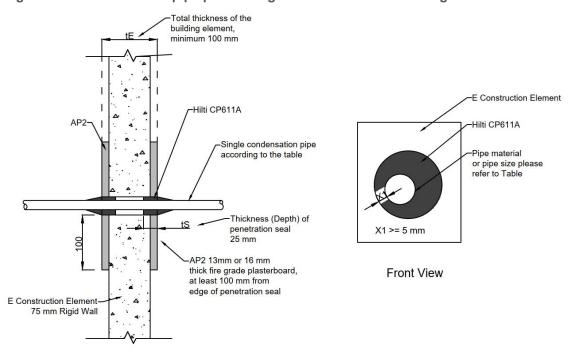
Condensation pipe penetrating minimum 75 mm thick rigid wall with build-up
